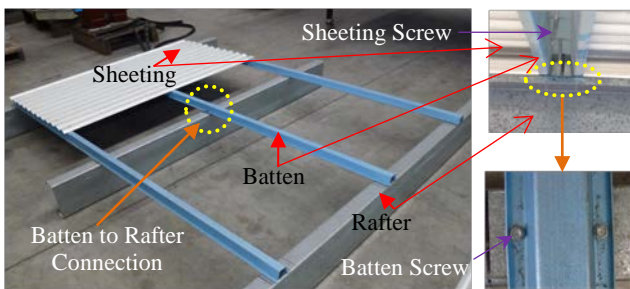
Light Gauge Steel Roofing System and Roof Batten to Rafter or Truss Connection
